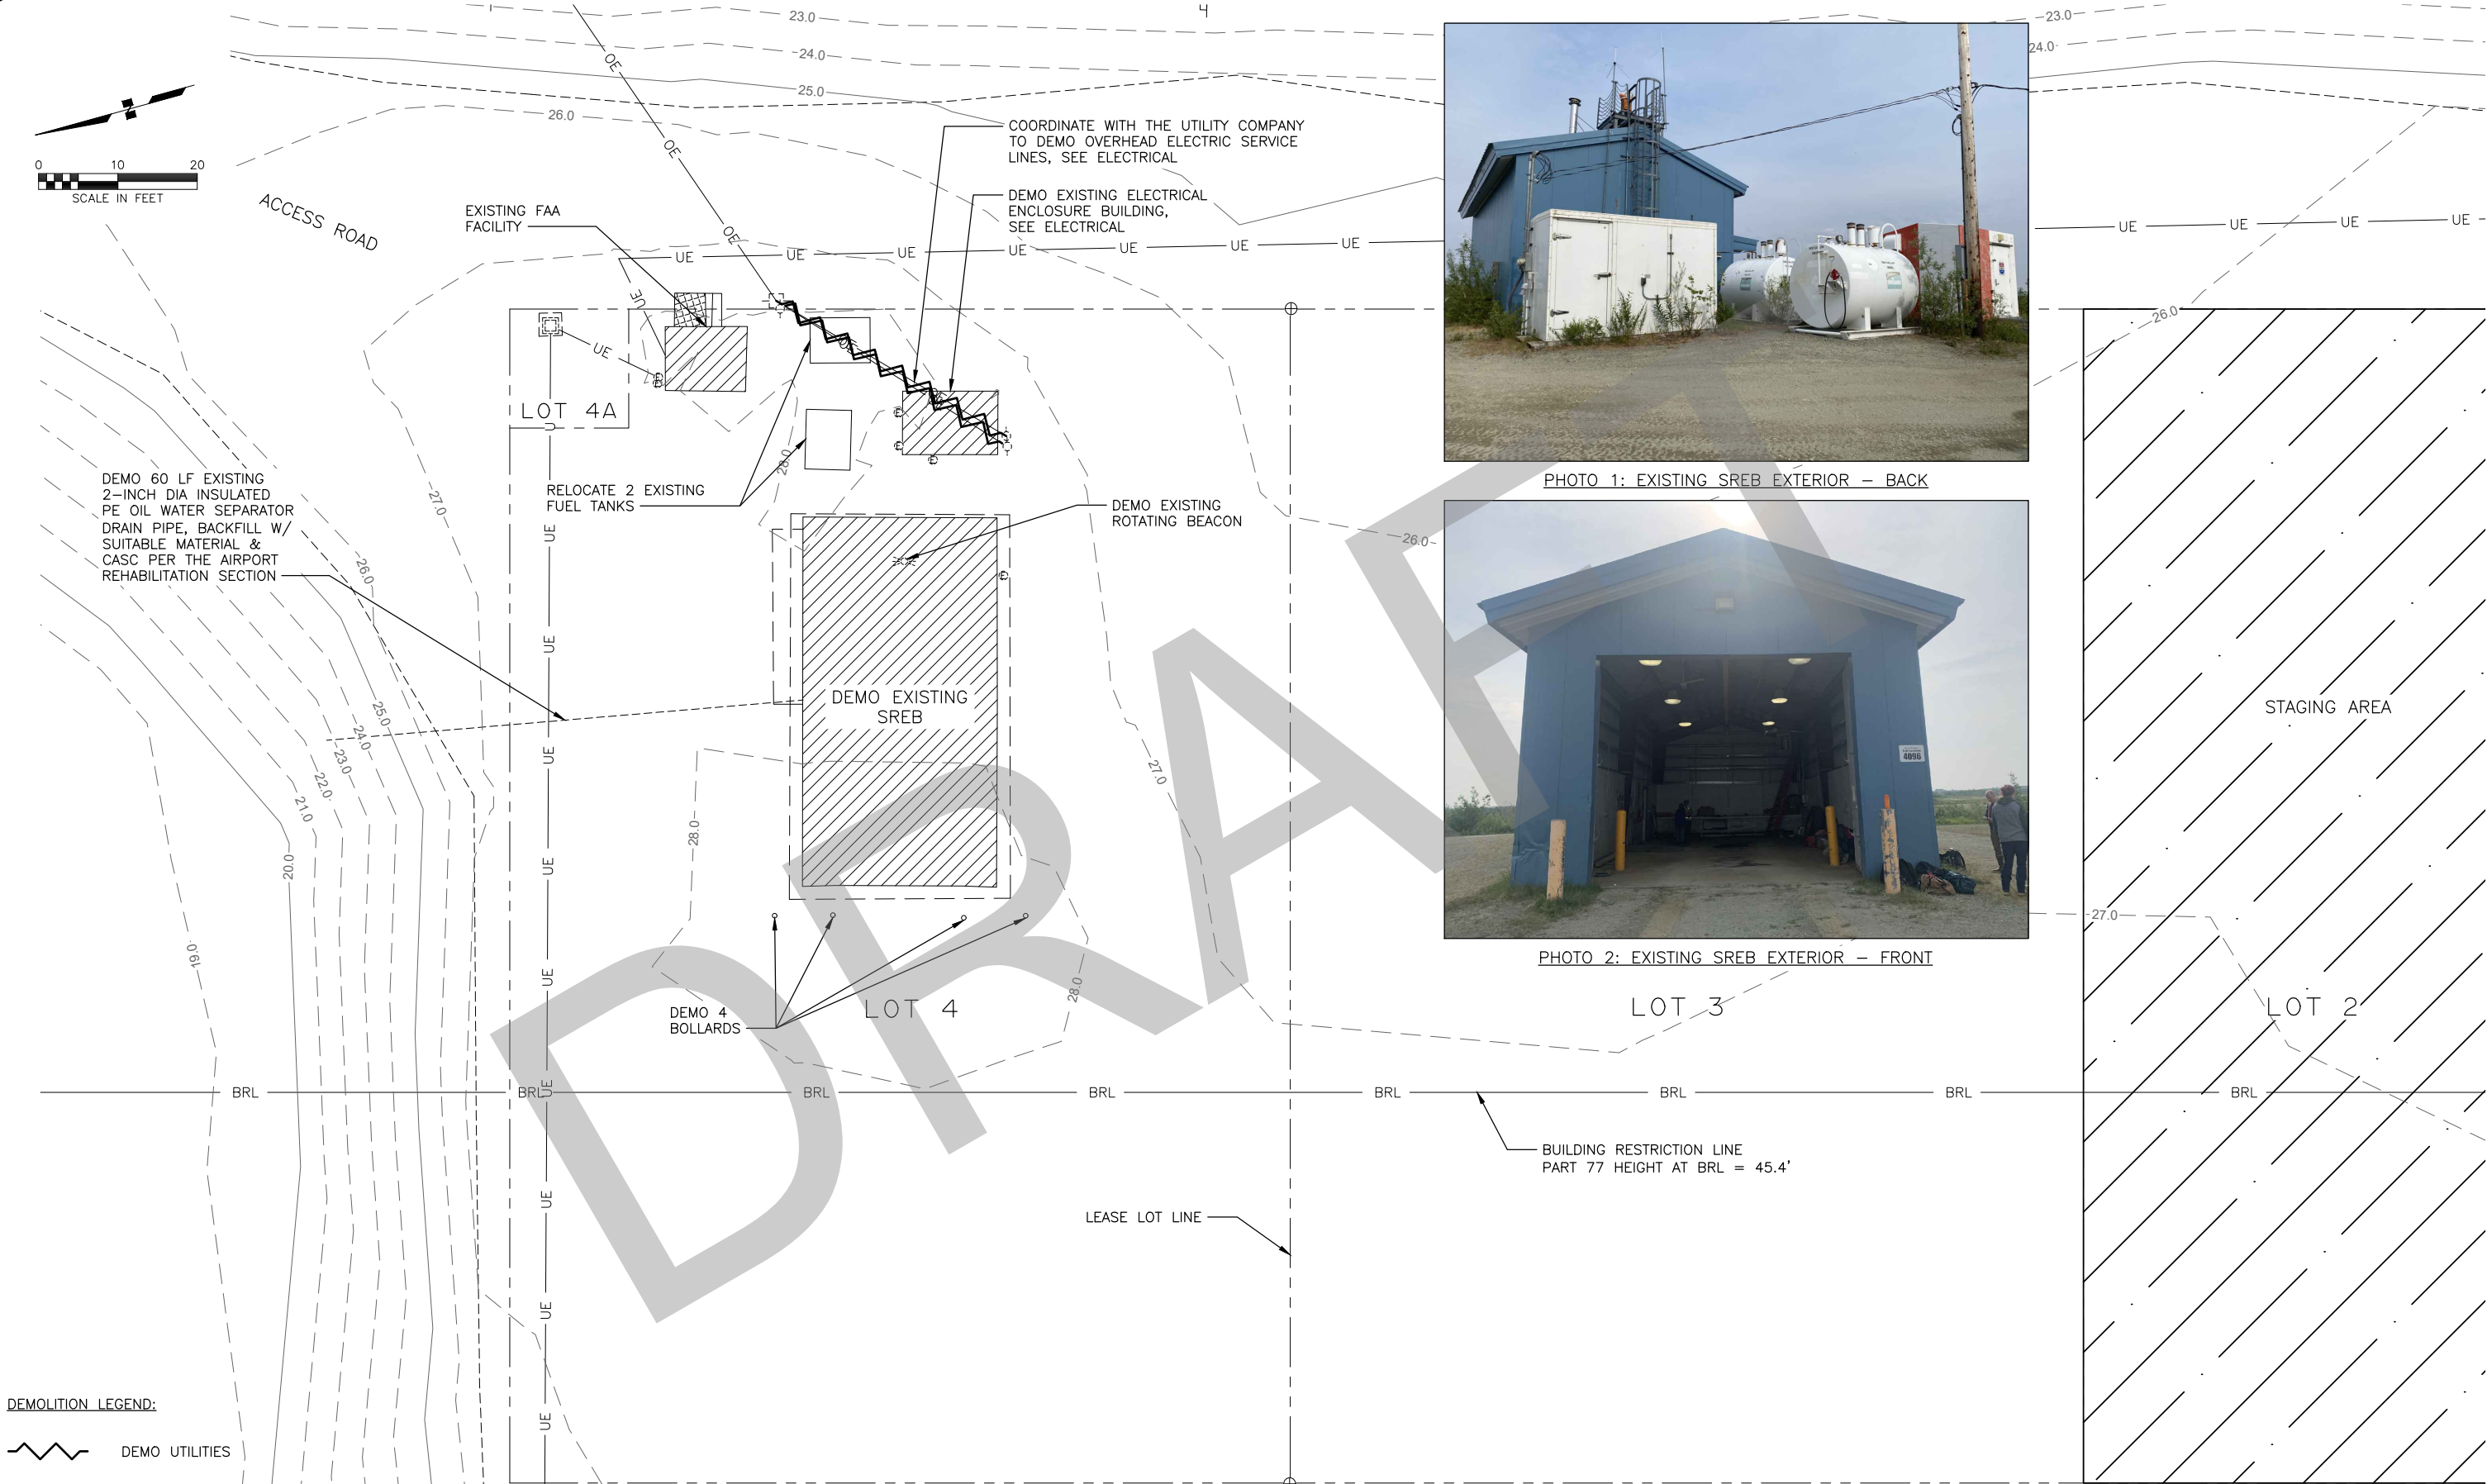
EXISTING SREB EXTERIOR - BACK
